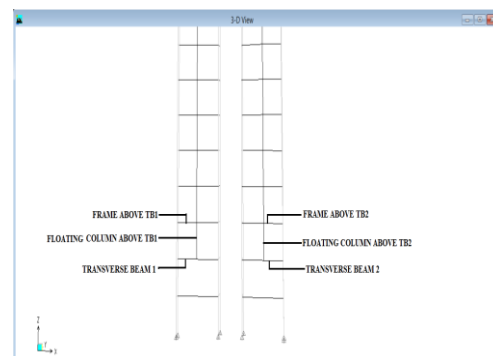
D view of transverse beams, floating columns and frame above transverse beams
